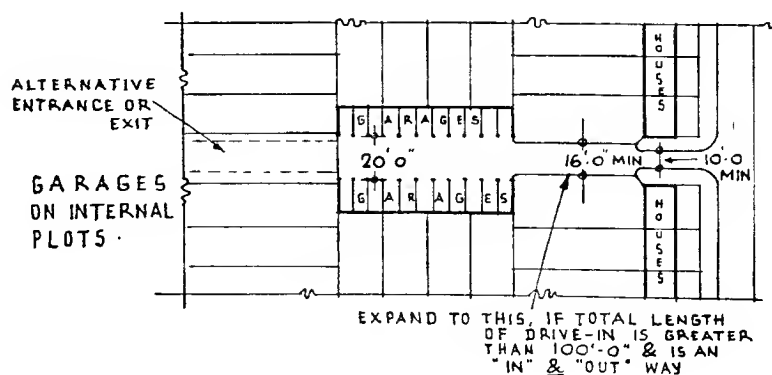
Typical layout for grouped garages in residential areas, the minimum turning space of 20ft. is shown
